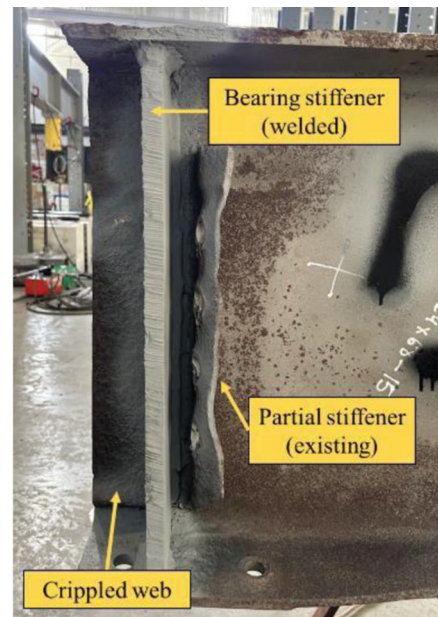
Specimen 7 bearing stiffener welded to far girder end.
